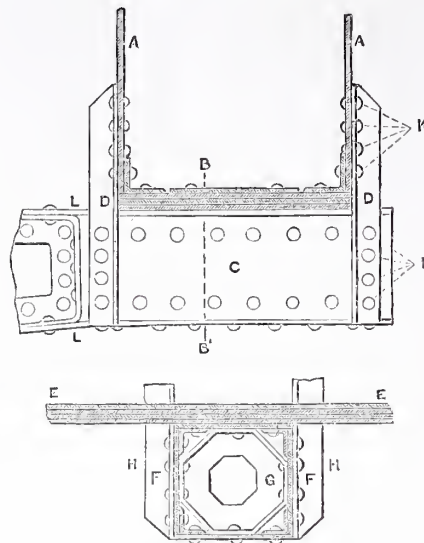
Connection of Cross Girder with Box Main Girder.
